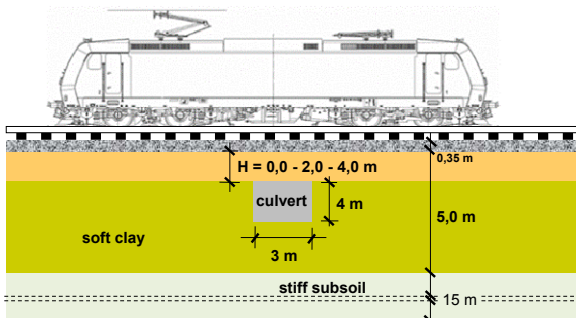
Longitudinal view of the track passing over the culvert (not to scale)
